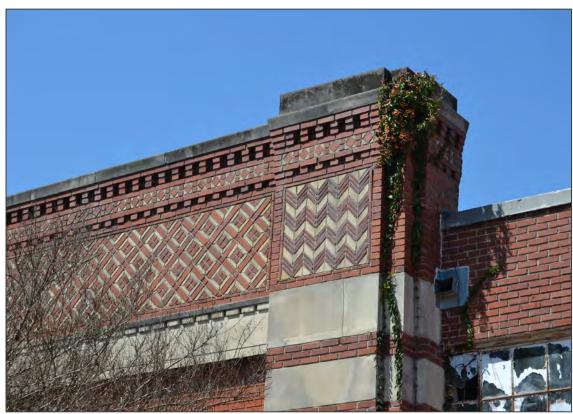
Ford Motor Co. Assembly Plant, South Elevation, Southwest Corner Brick Detail.
